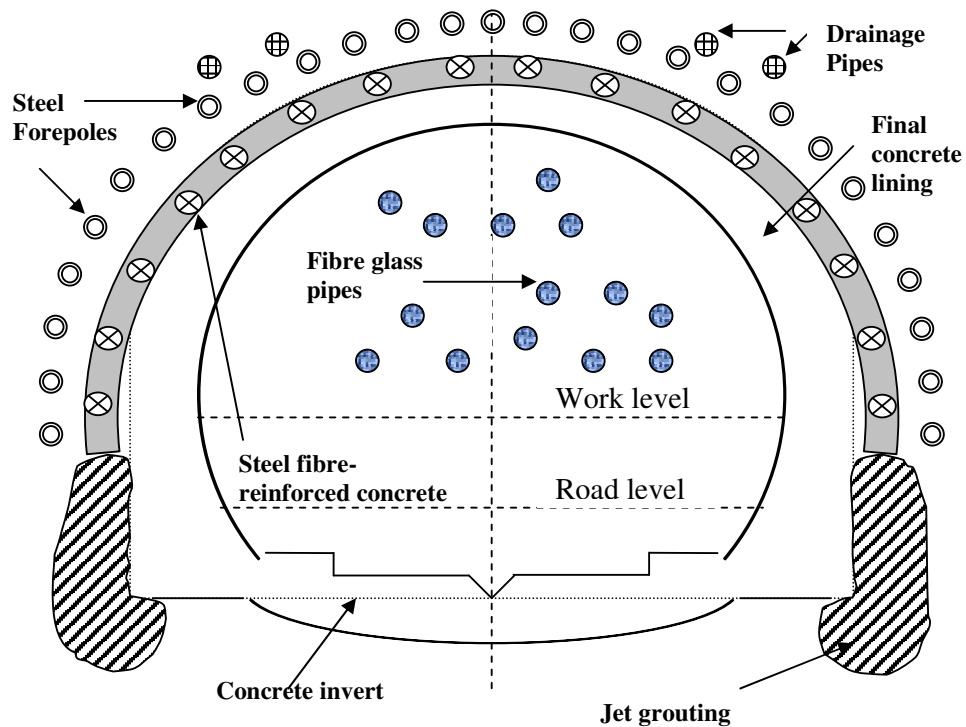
Cross-section showing an umbrella arch and face reinforcement.
